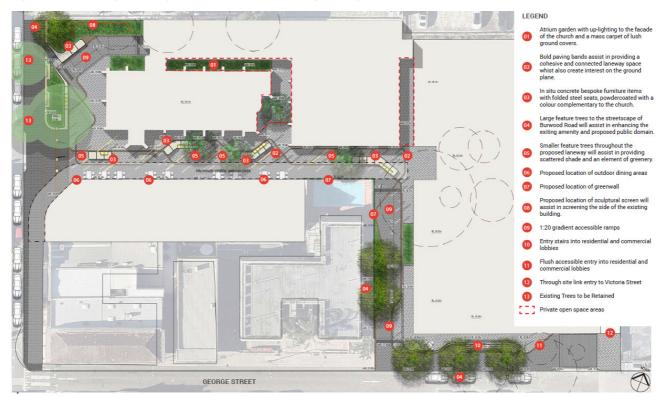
Landscape Concept Plan (Source: Place Design Group, 2018)
